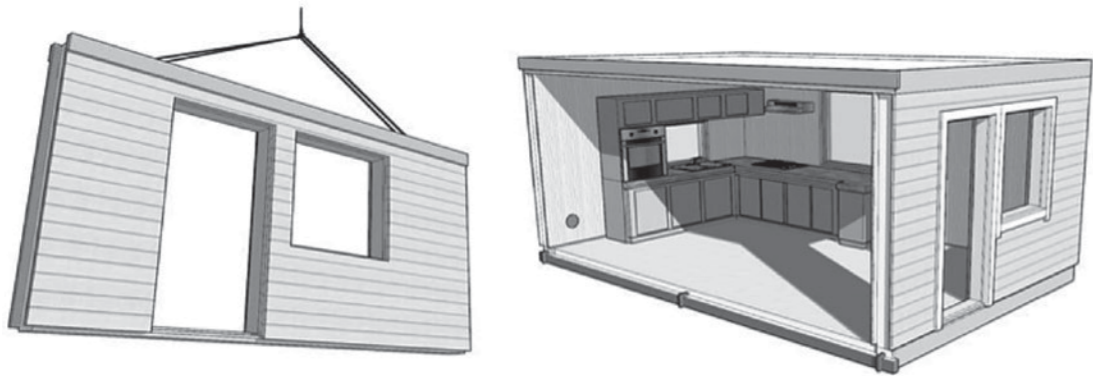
Example of prefabricated wall element (left) and prefabricated volume with timber frame (right).
